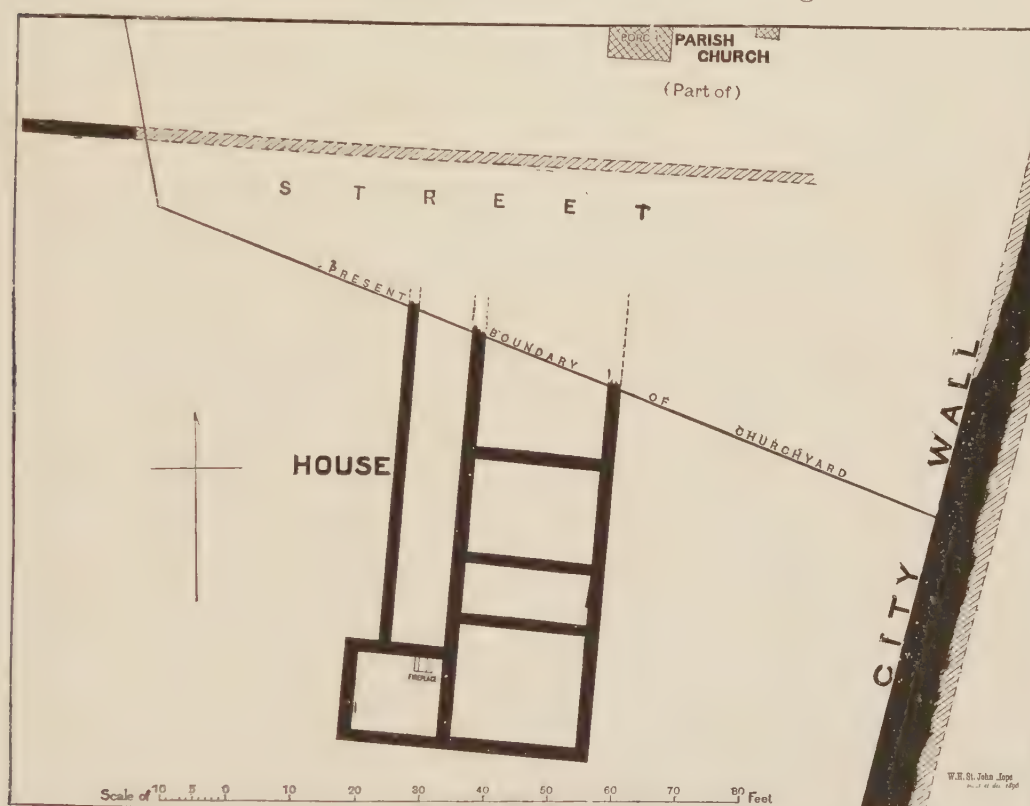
Plan of the foundations of a house uncovered to the south of Silchester parish church in 1896.
